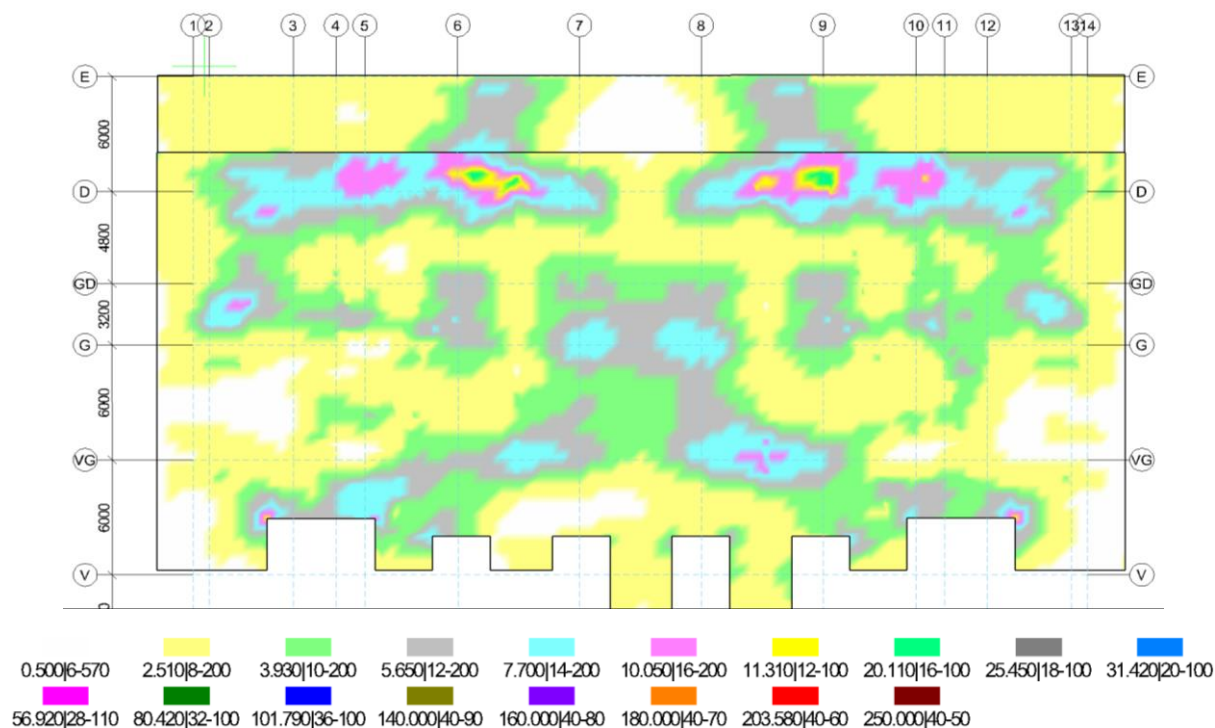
Reinforcement of the foundation. Upper longitudinal reinforcement in the direction of the axis R, cm^2/m [14]
